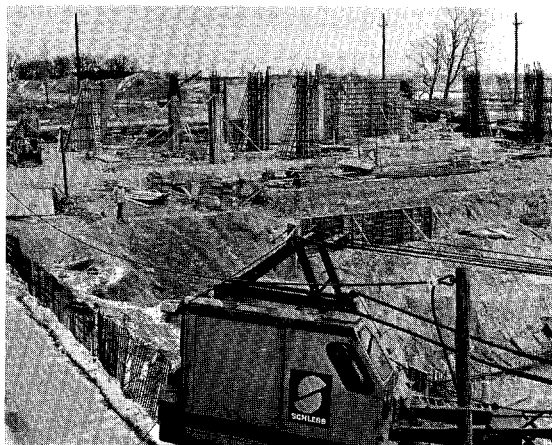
Work on the Central Laboratory, viewed from the Linac Building. The basement is at the right of the photograph; the north-wall and column forms are beyond the crane.
